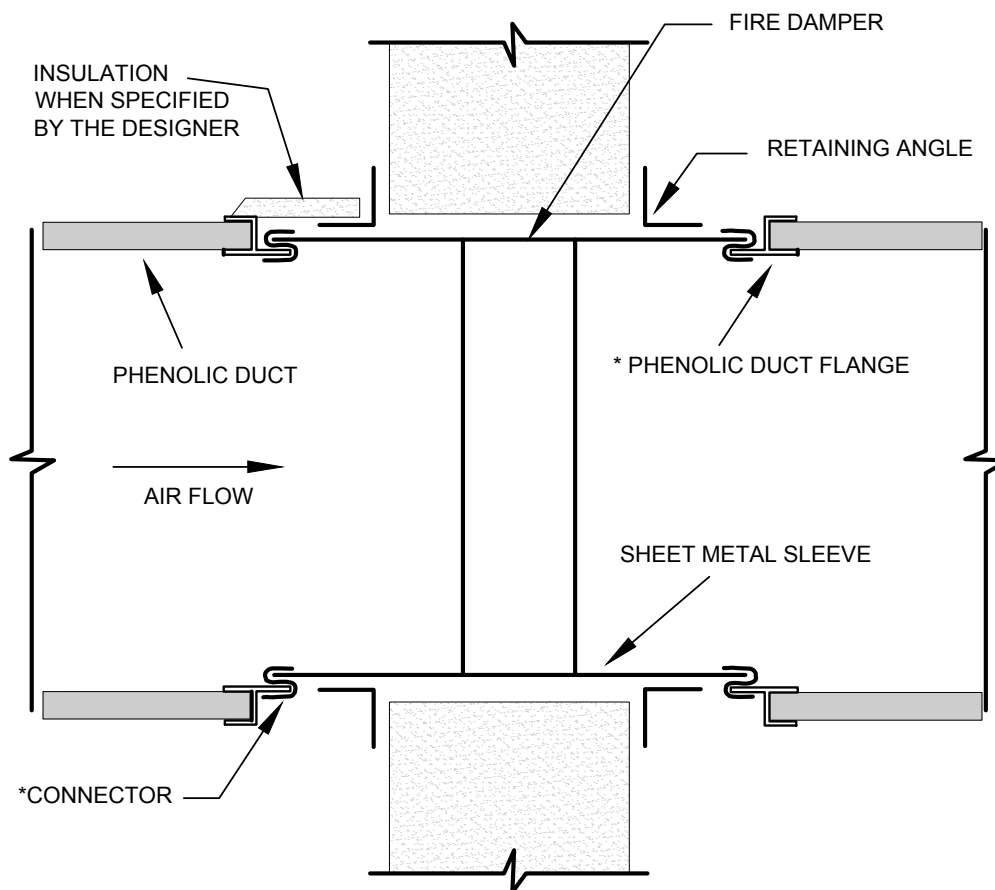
HVAC EQUIPMENT CONNECTIONS
